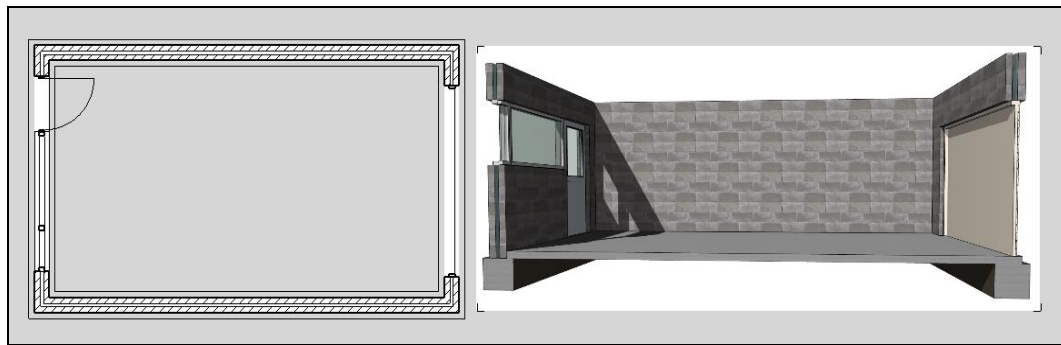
Preliminary design sketches of a Garage-project; a traditional floor plan and a slice of the model in perspective projection (Created by: F. Acs)
